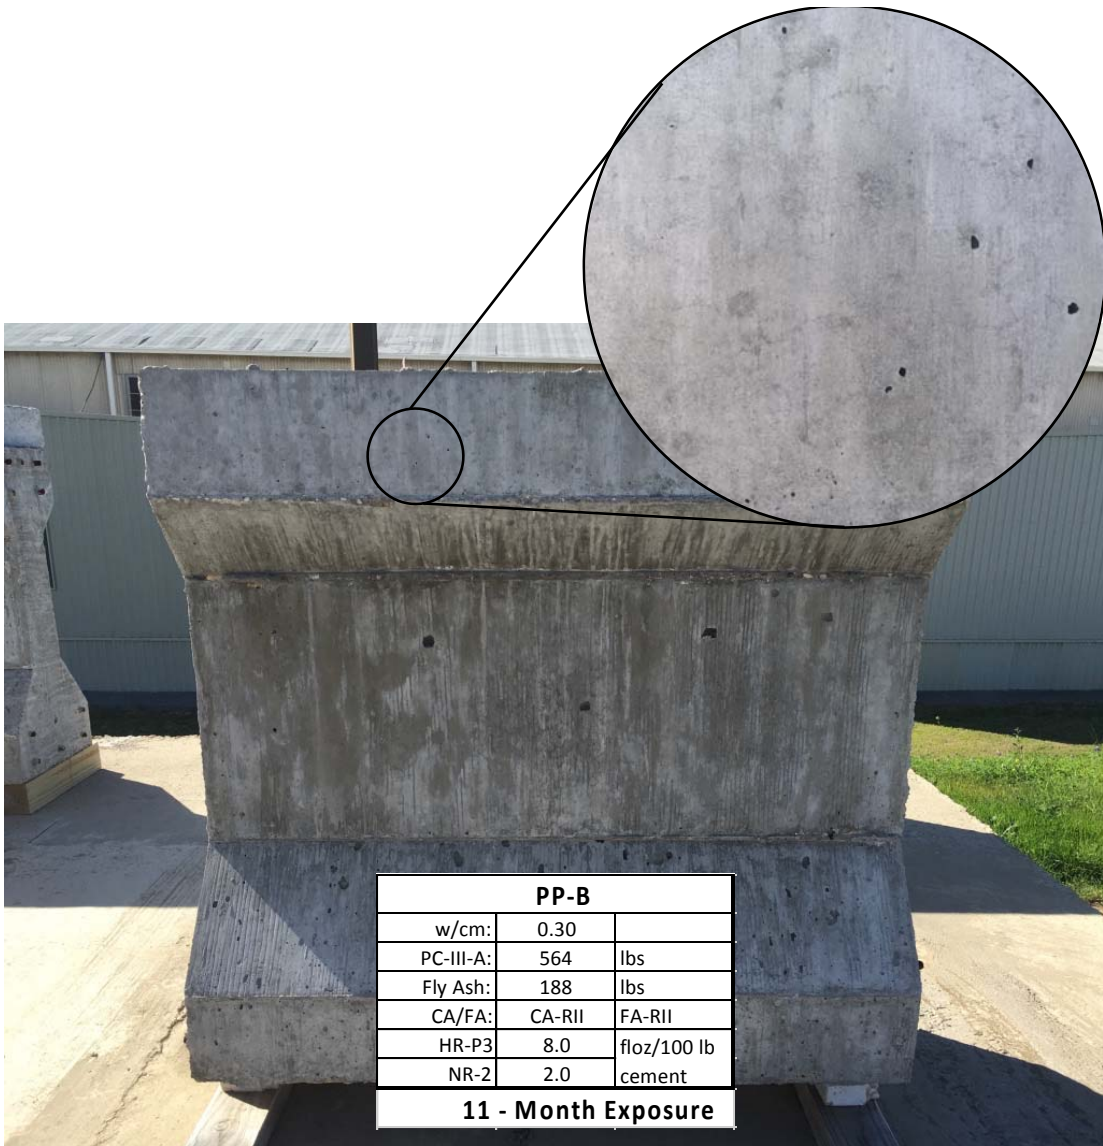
Precast Plant B (PP-B) Mini Girder with a crack rating of 2
